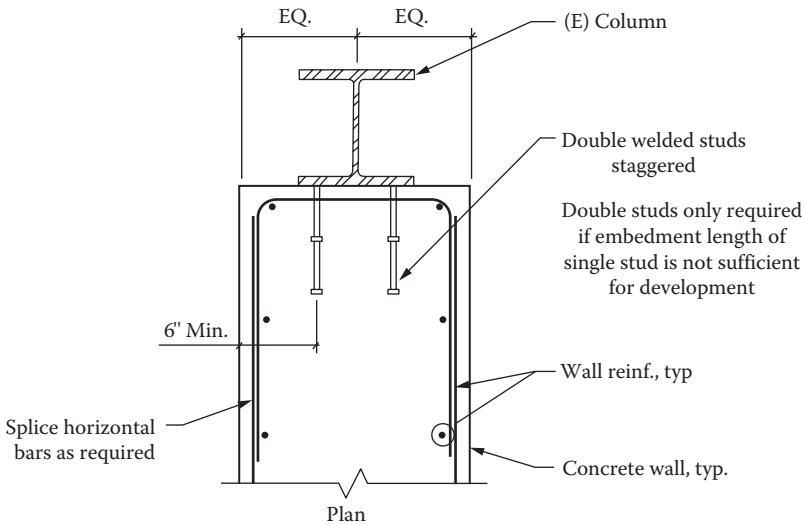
Wall at existing column. *Note:* Detail not appropriate for special reinforced concrete structural walls due to lack of confinement for boundary element.
